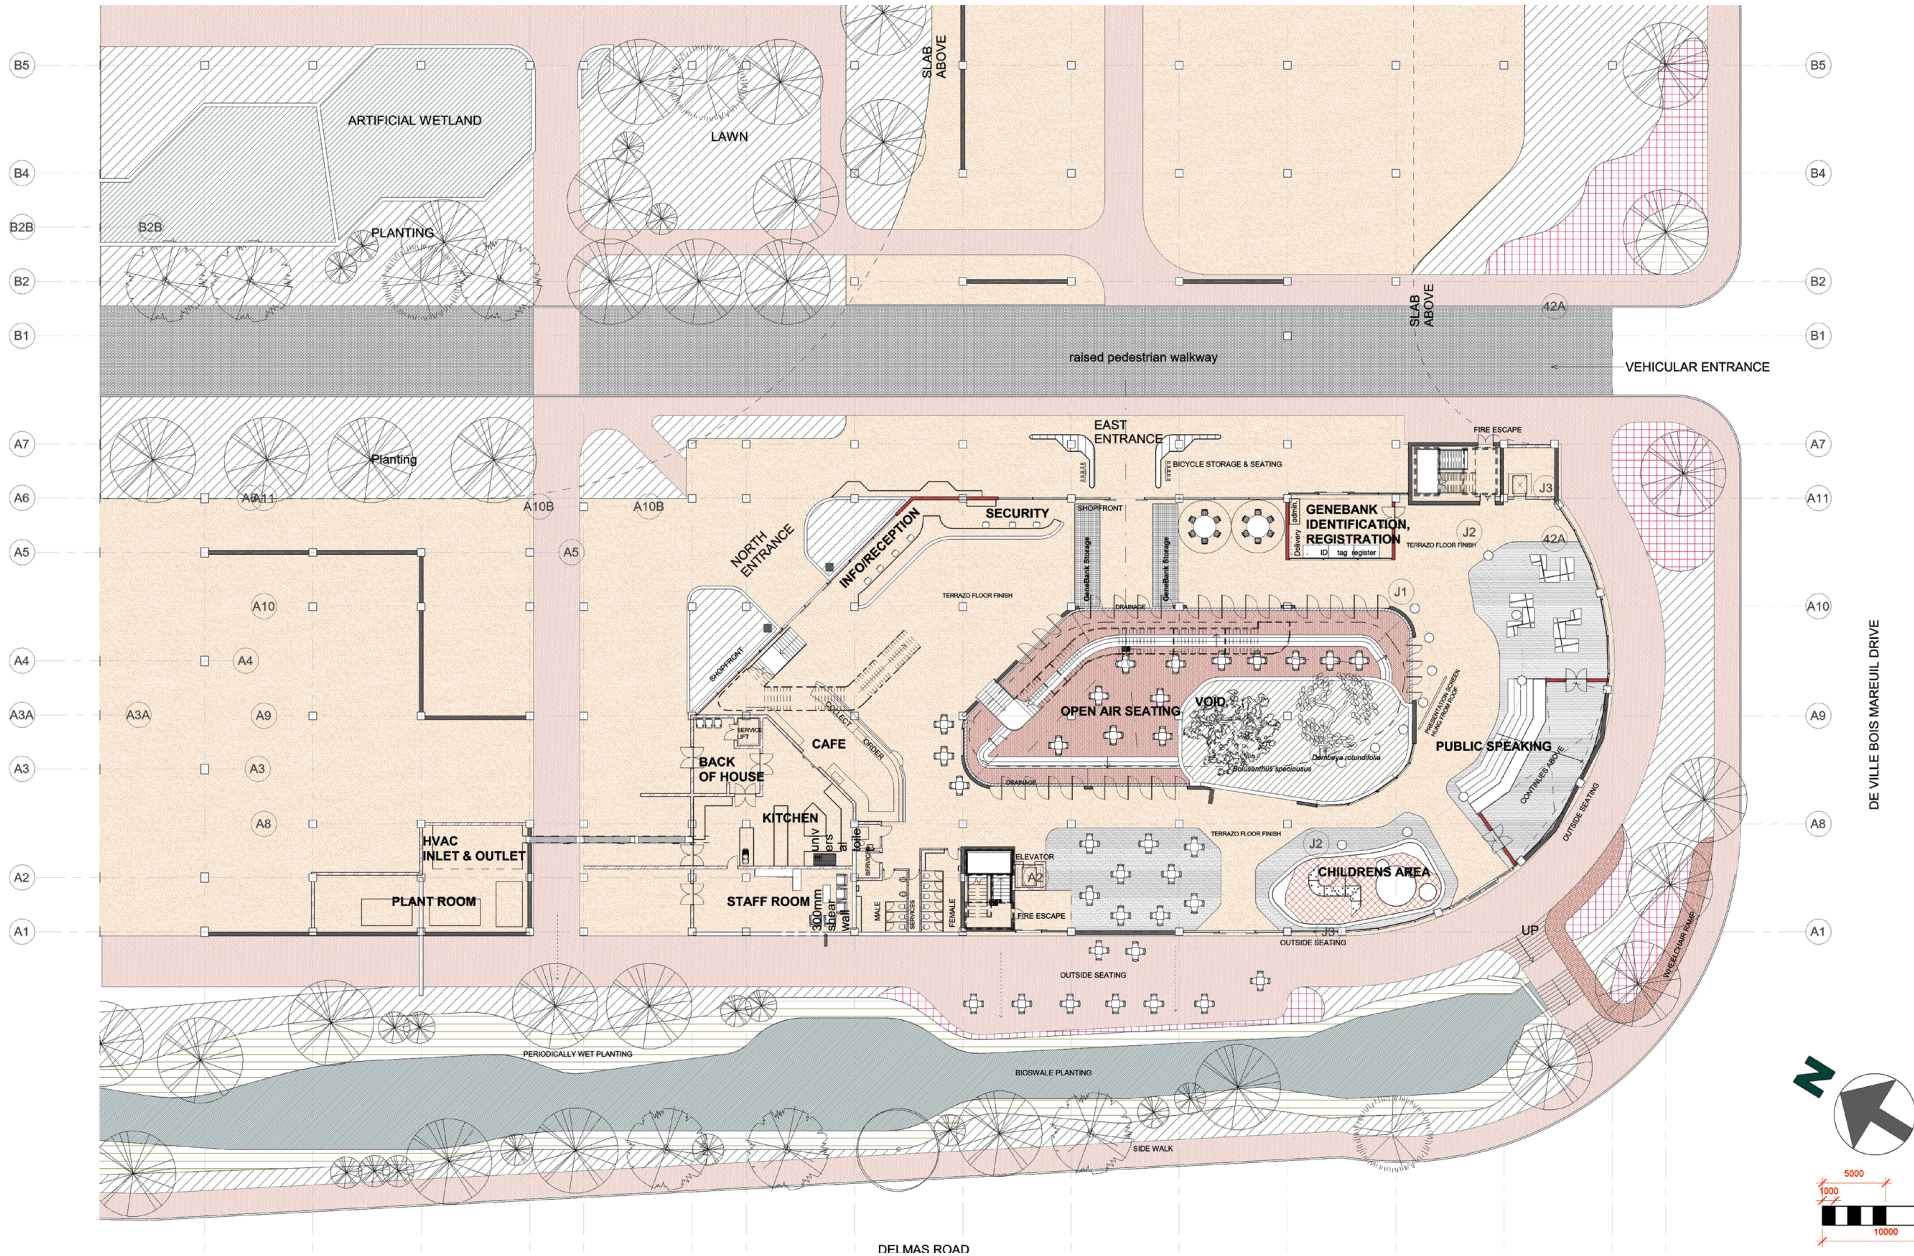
GROUND FLOOR APPROACH EAST ENTRANCE (AUTHOR 2021)
